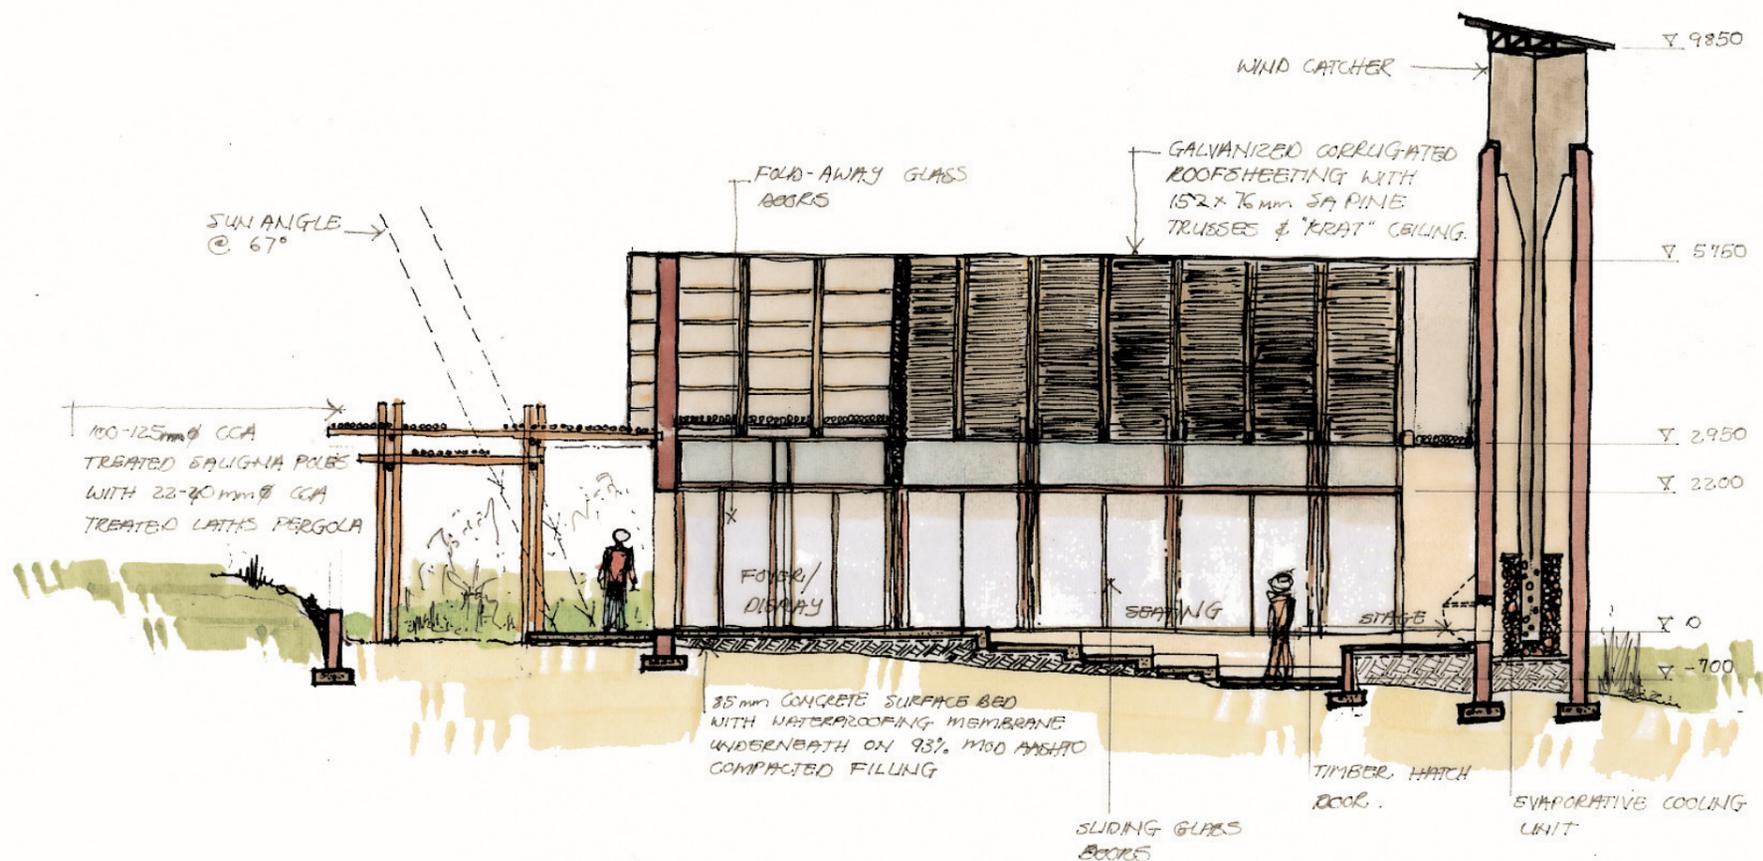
Longitudinal section of conference facility
